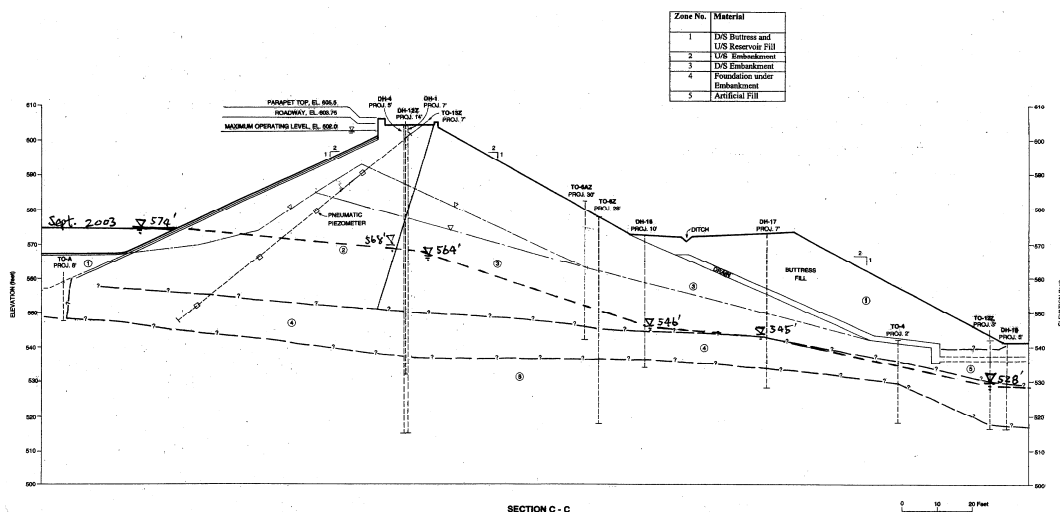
Maximum Cross Section of Piedmont Reservoir Embankment
